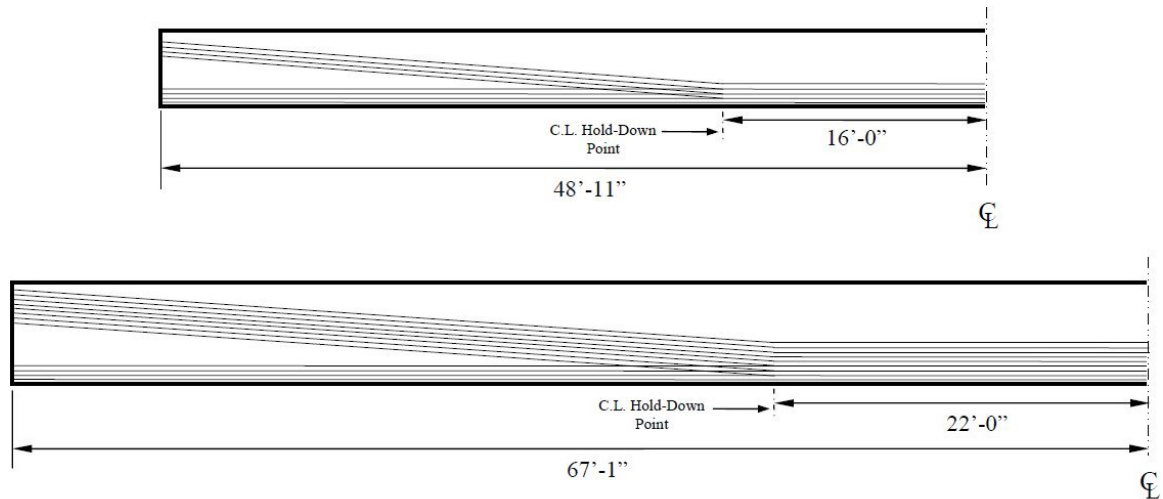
Profile of draped strands for (top) BT-54 girder and (bottom) BT-72 girders
